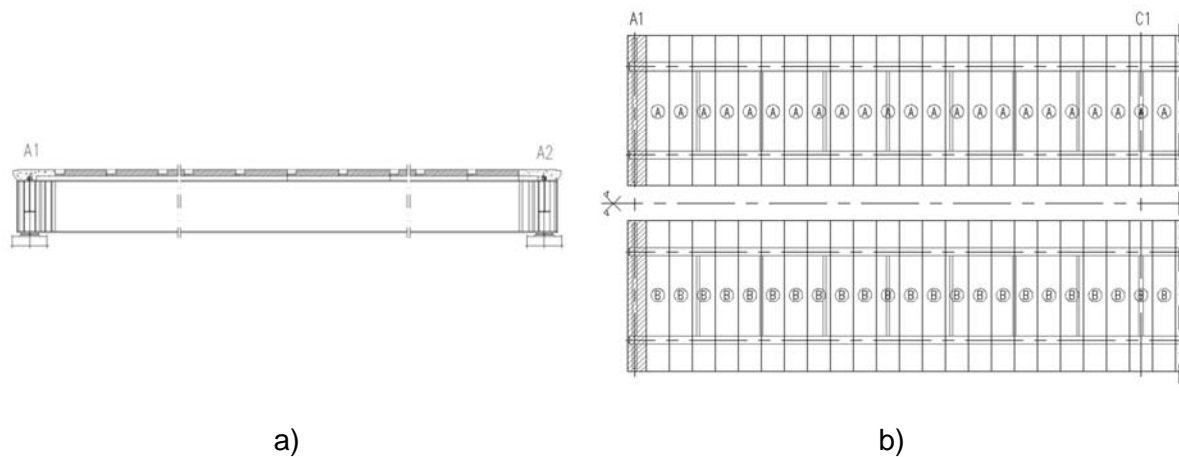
Precast concrete slabs [105]: a) side view; b) horizontal plan.
